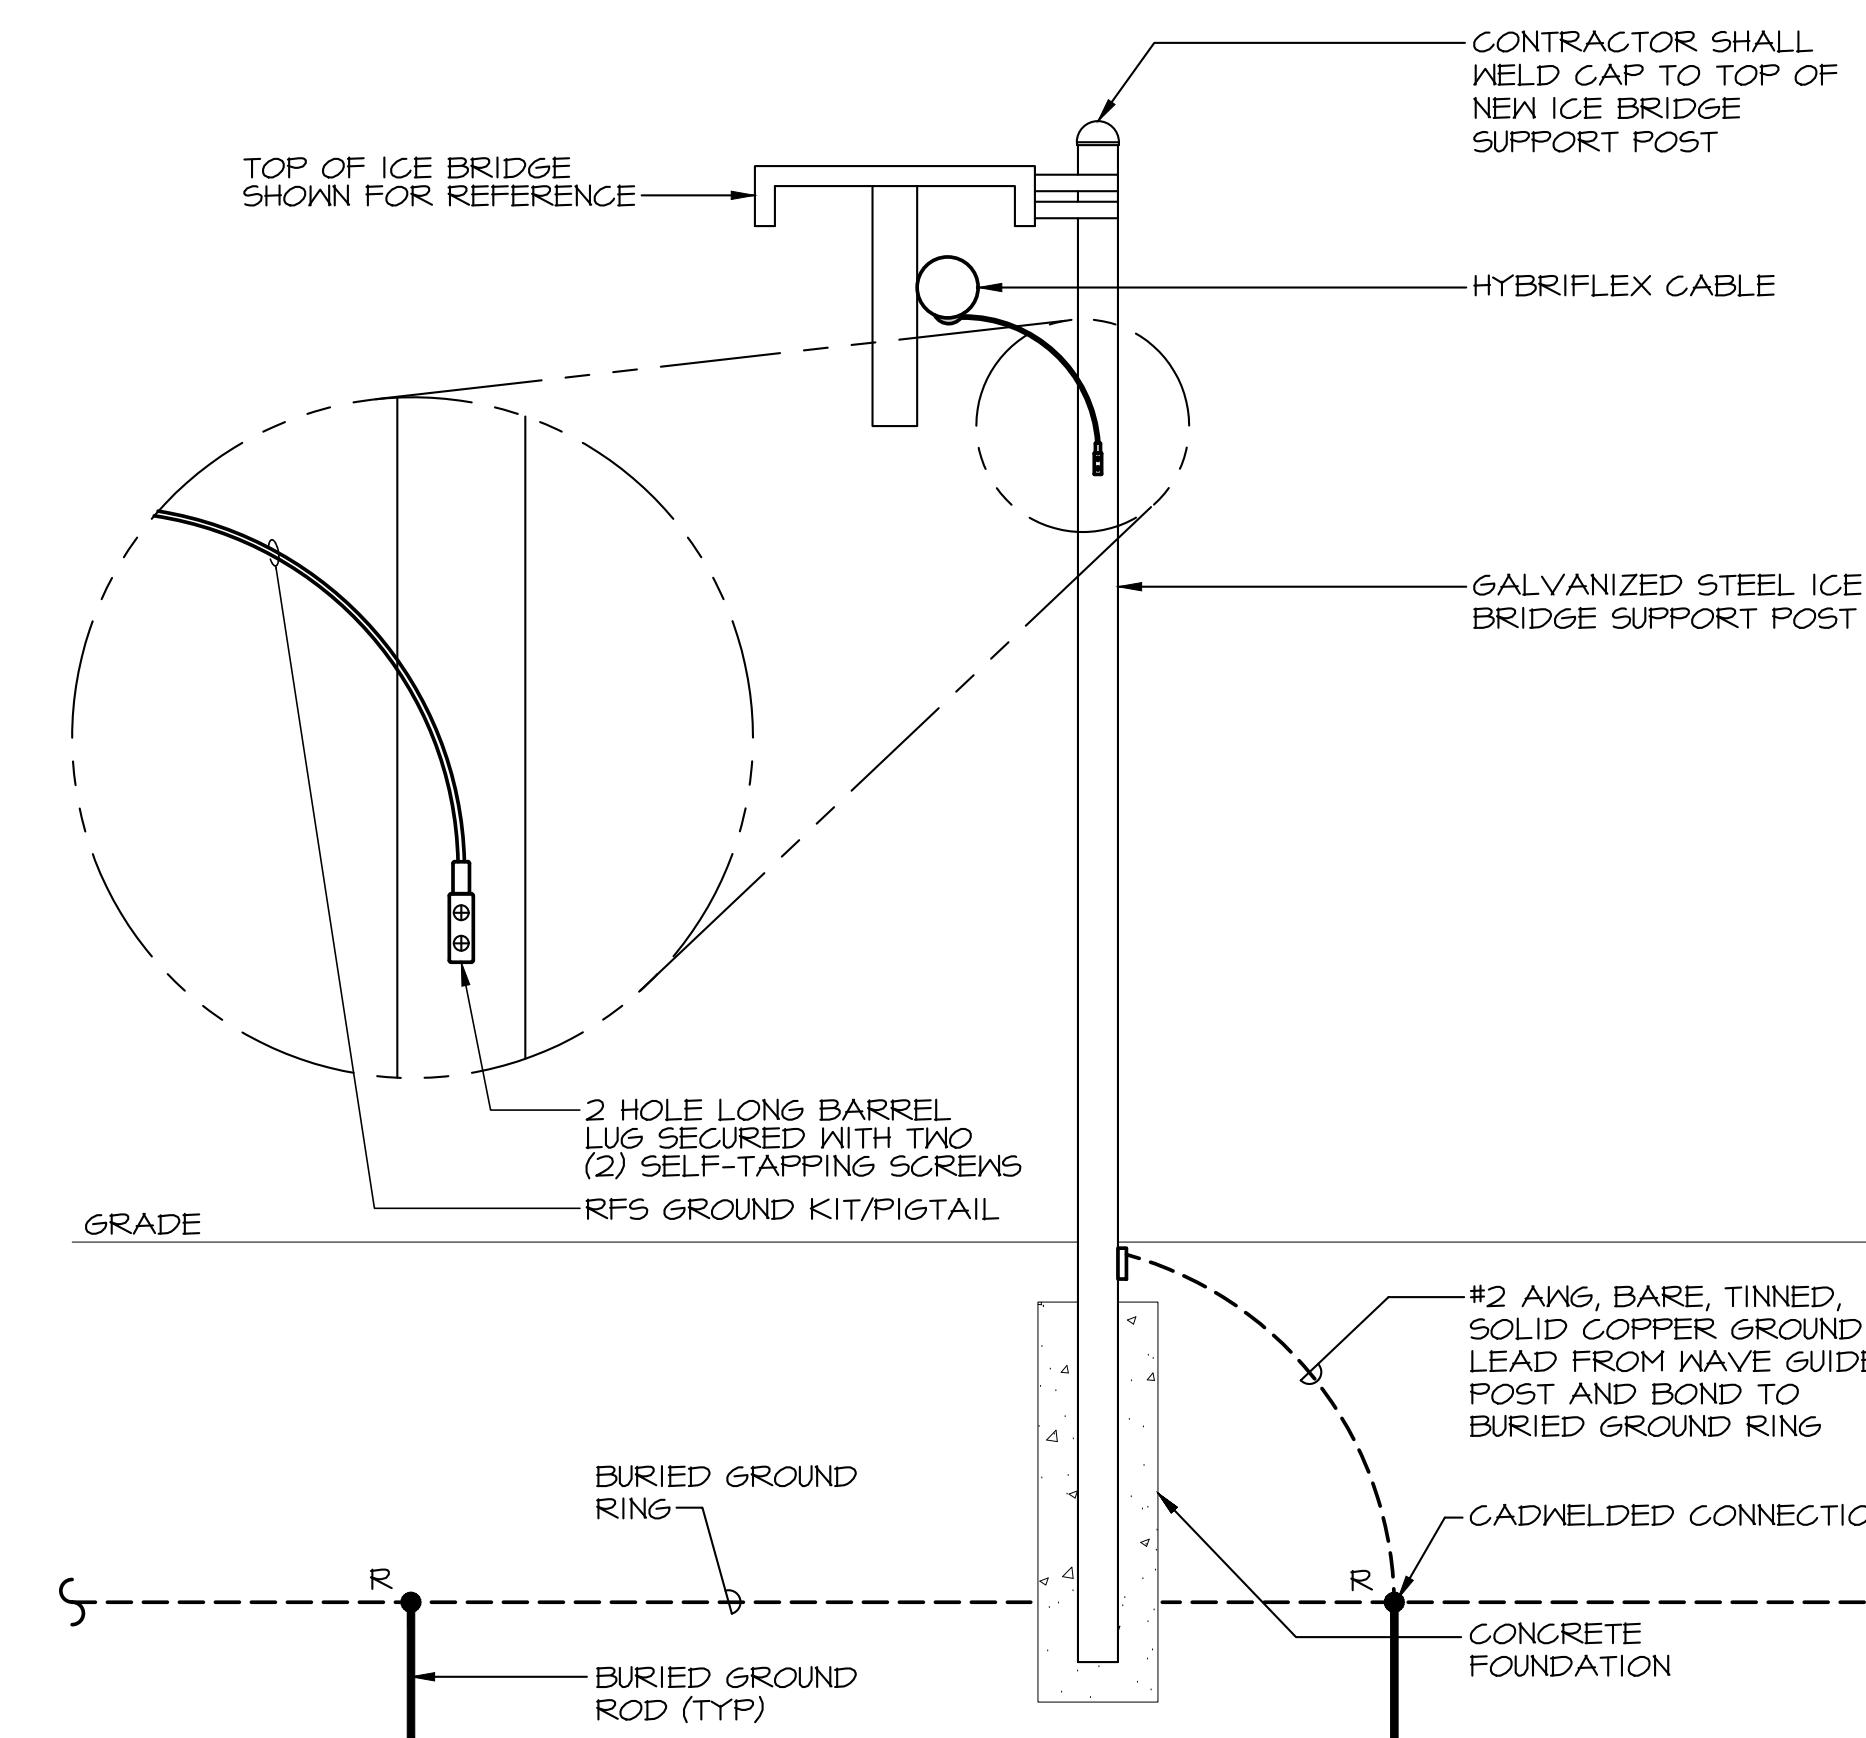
DETAIL - EQUIPMENT/ICE BRIDGE SUPPORT
